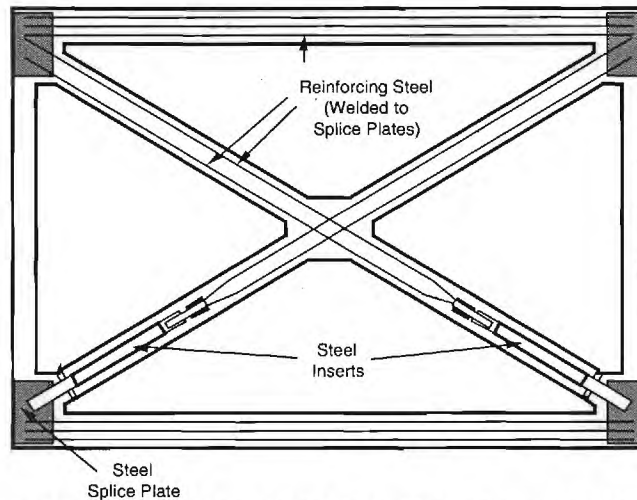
Braced Concrete Wall Panel with Steel Inserts. From [Matthewson and Davey 1979]
